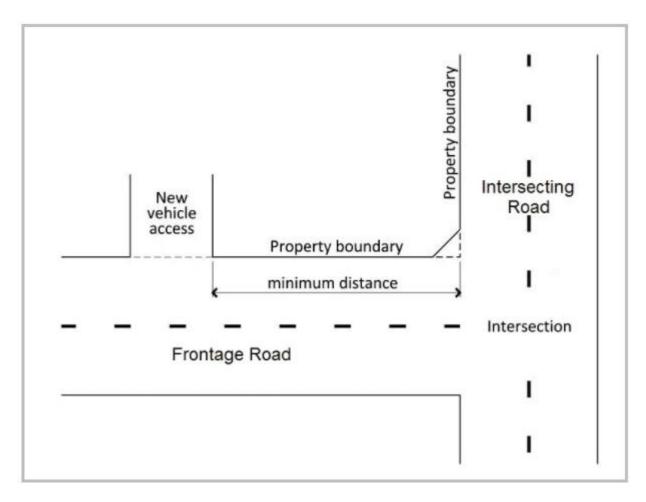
Christchurch District Plan Figure 16 - Minimum distance of vehicle crossings from intersections outside the Central City
